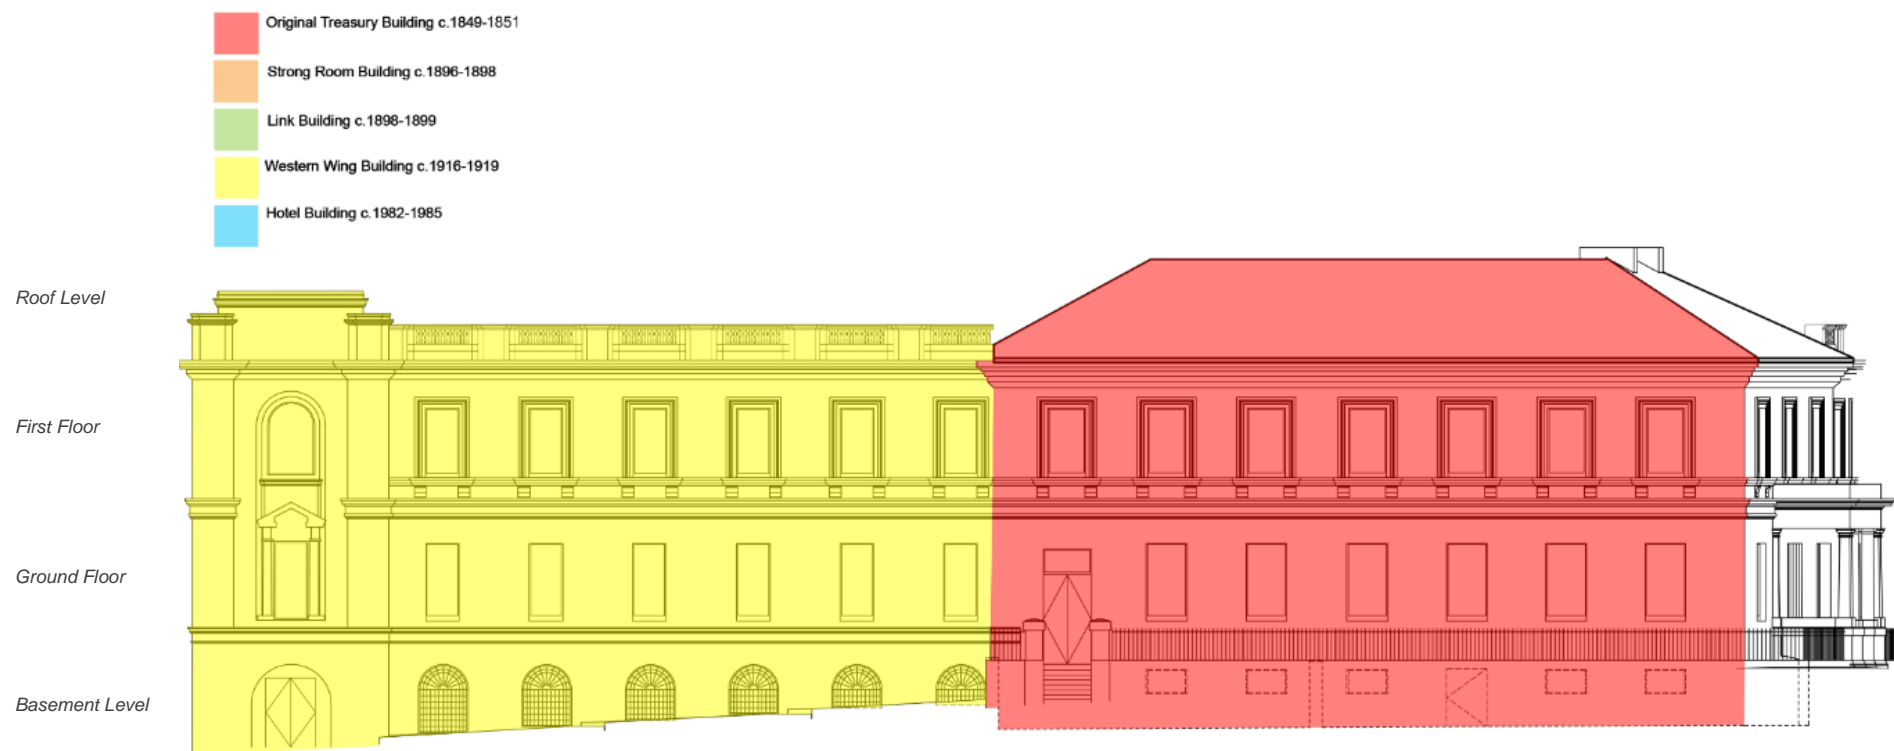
Extract of ‘as built’ plans showing period of construction – Bridge Street elevation. Note that the entrance steps to the Bridge Street elevation of the Original Treasury Building were reconstructed in the 1980s, however they are shown in ‘red’ above, to indicate that they were an original element to the building.
